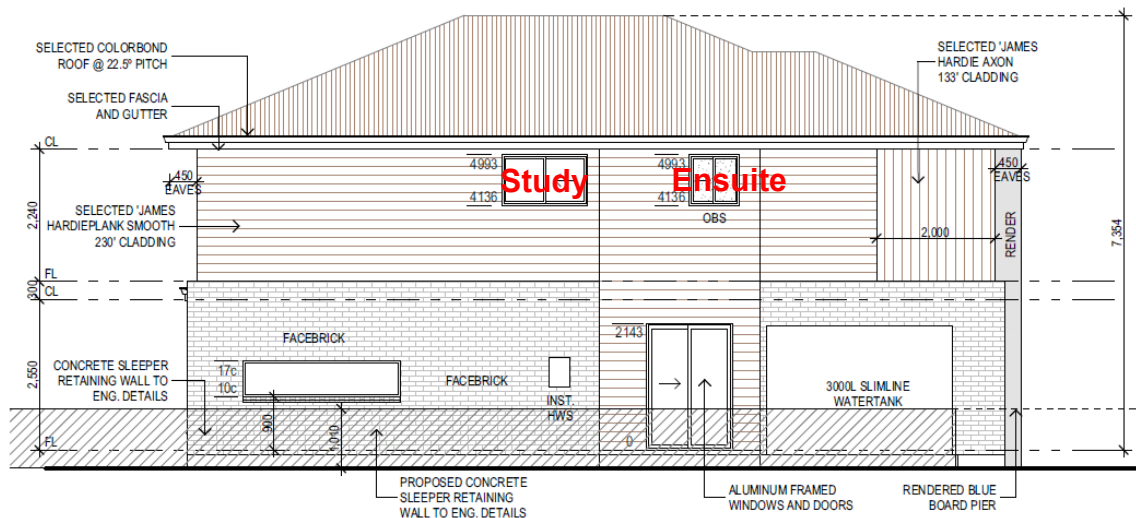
North-east elevation of proposed dwelling on Lot 5.
